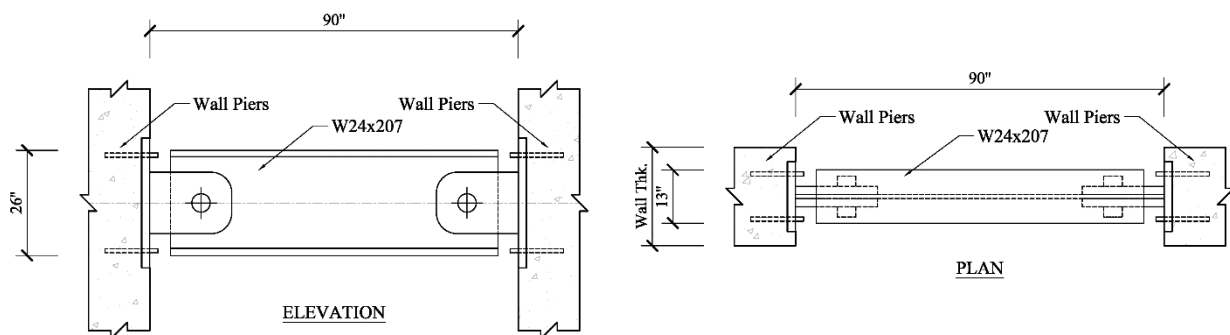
Conceptual drawing of the steel coupling beam with rotational friction connection
